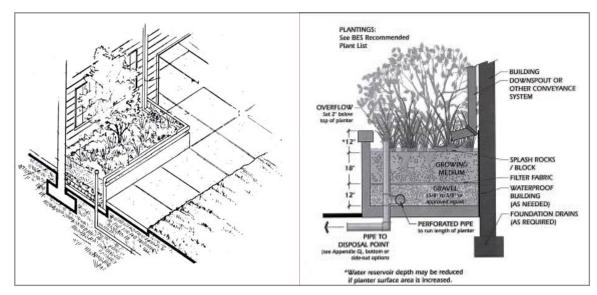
Stormwater Planters (Source: City of Portland, OR, 2004)
